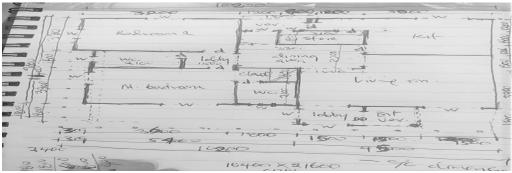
Hand drawn sketch of the floor plan of the two-bedroom unit
